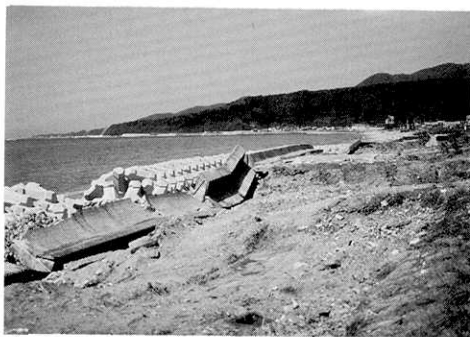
Damage of sea wall at Hirahama in Taisei Town.
